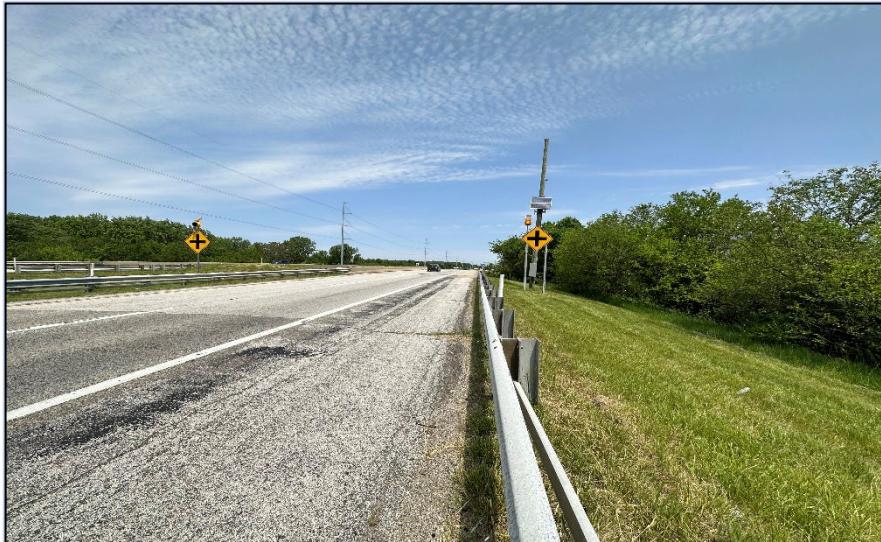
Facing north toward the northbound bridge from SR 63 northbound.
